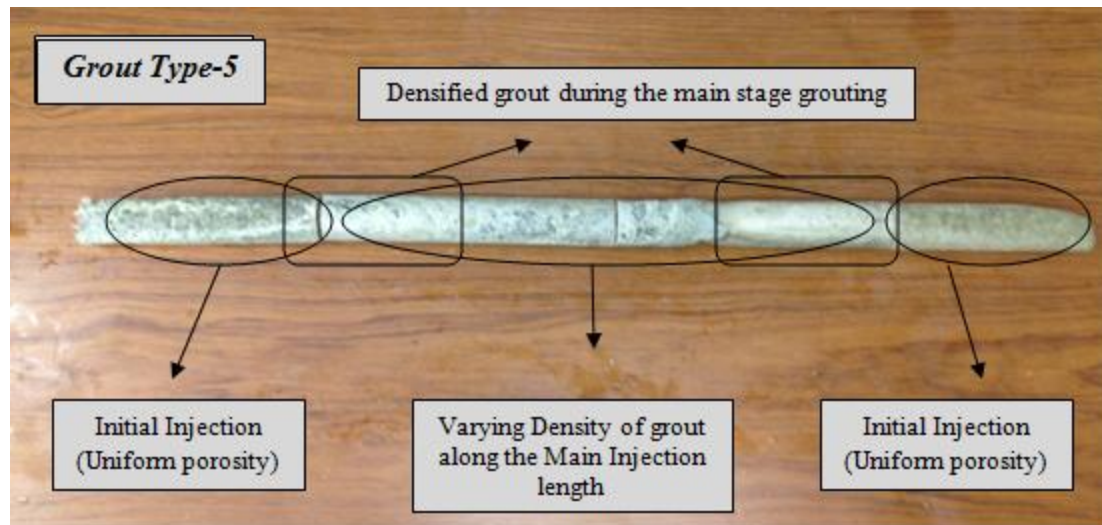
The structure of the grout along the 5 feet long pipe grouted with Grout-5
